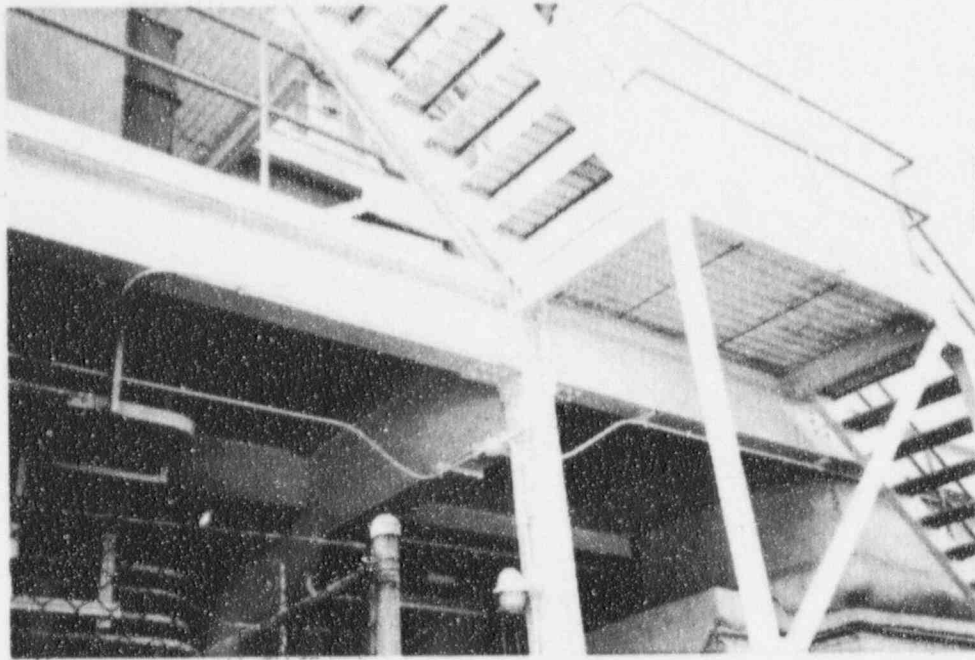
Typical Moment Connectors for Building Structural Steel
